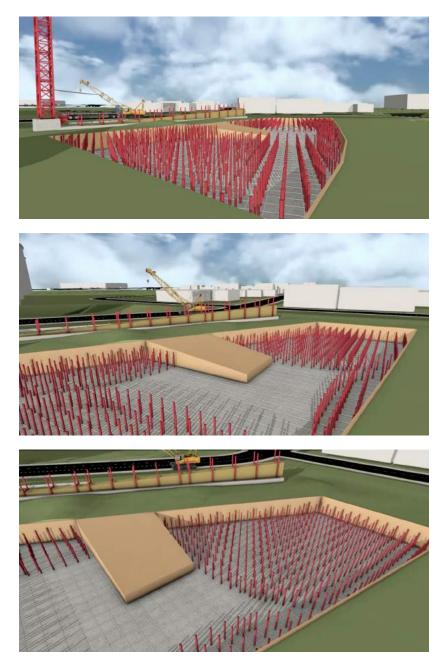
Installation of steel stanchions embedded into a mat slab provides a framework for easy installation of sub-assemblages later. Stanchions are anchored to a setting out slab which doubles as a waterproofing protection slab.
